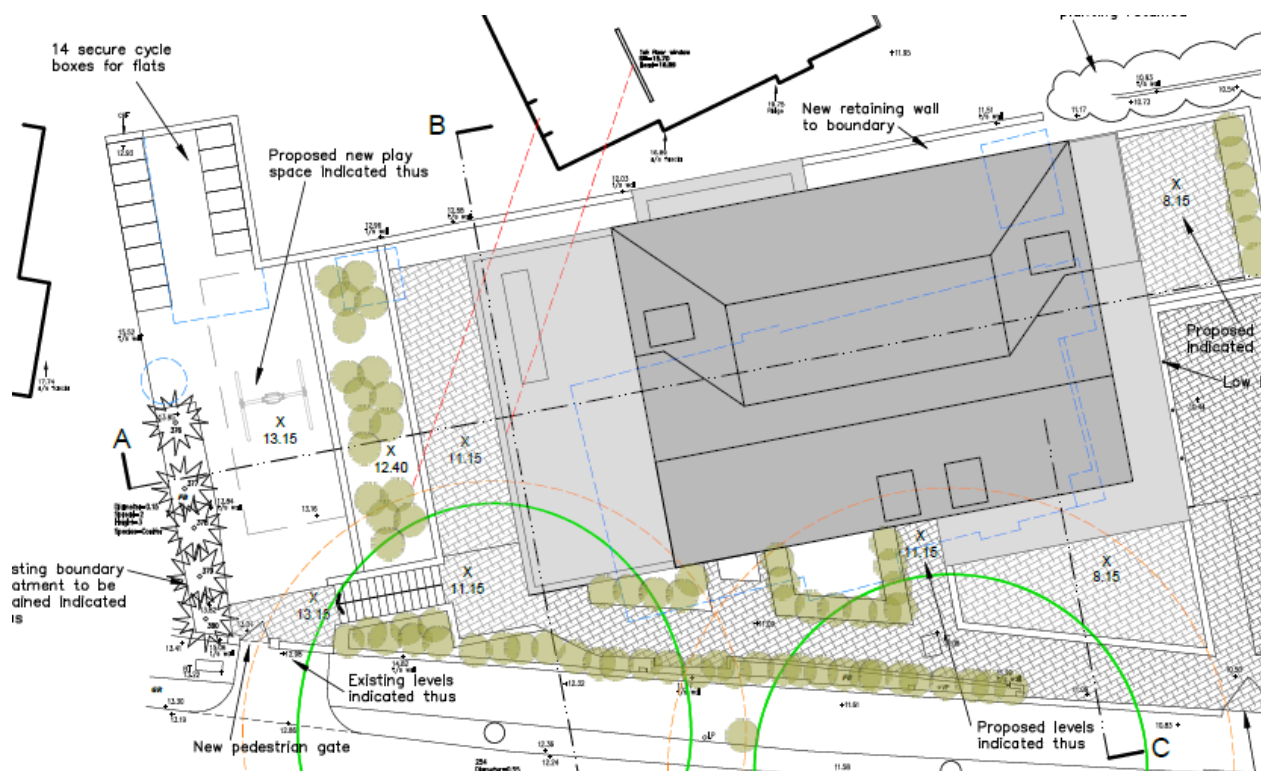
Block Plan with adjoining occupiers at 1a Smitham Downs Road
